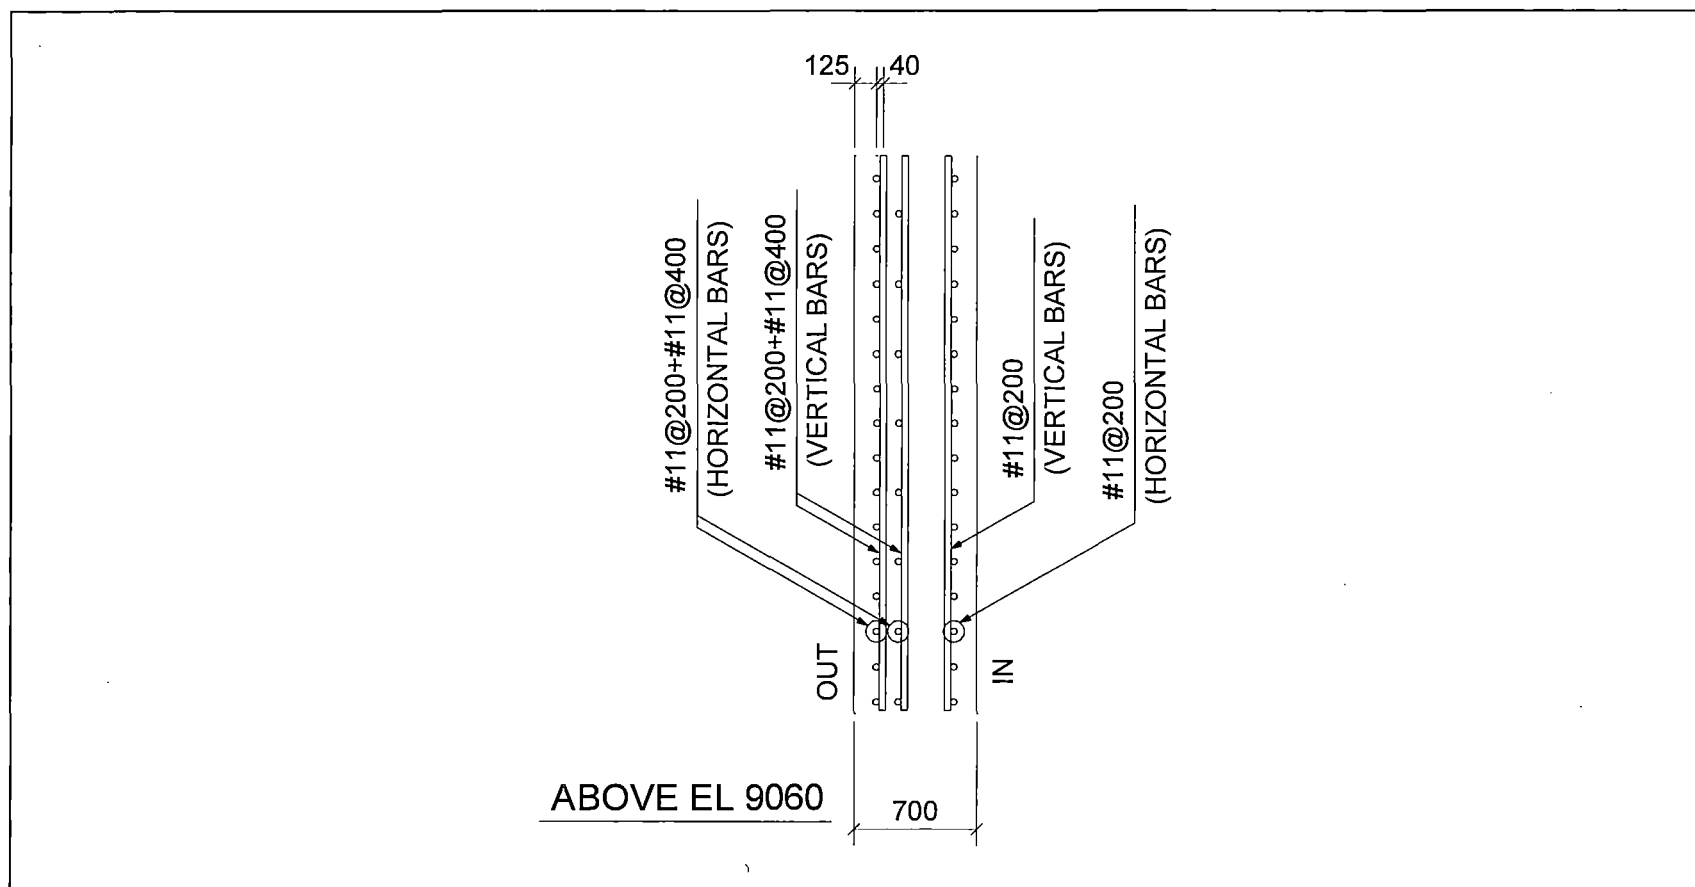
Assumed Walls Rebar Arrangement (Continued)
